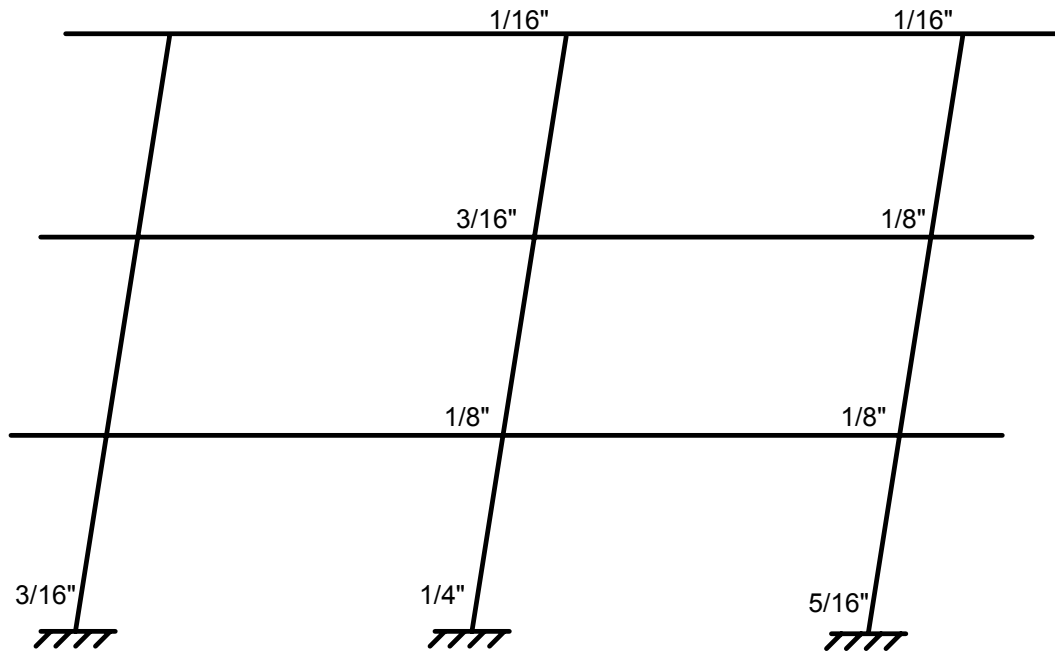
Flexural Crack Widths Frame B, North 3% Roof Drift
